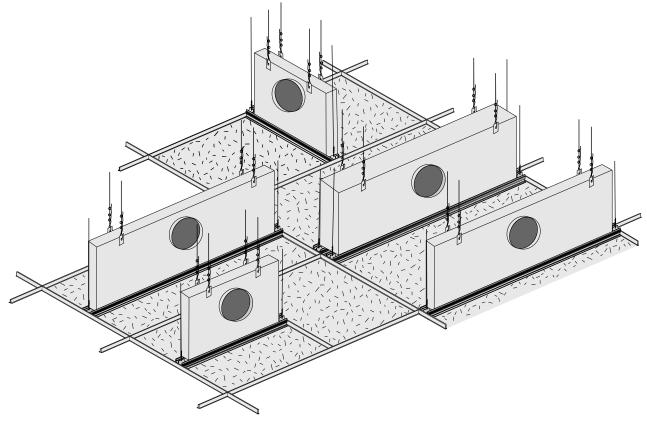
Example of Fineline suspension ceiling installation with type G frame.
